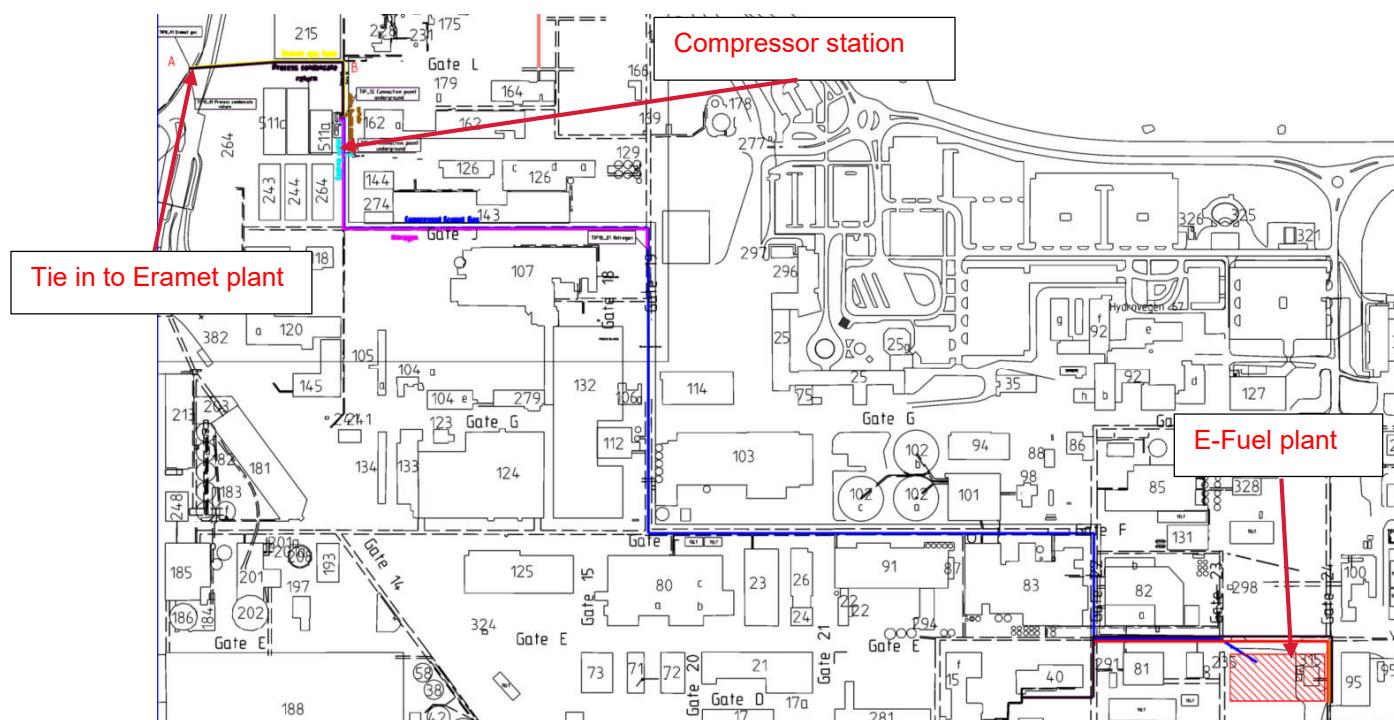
Pipeline routing between Eramet and E-Fuel plant
